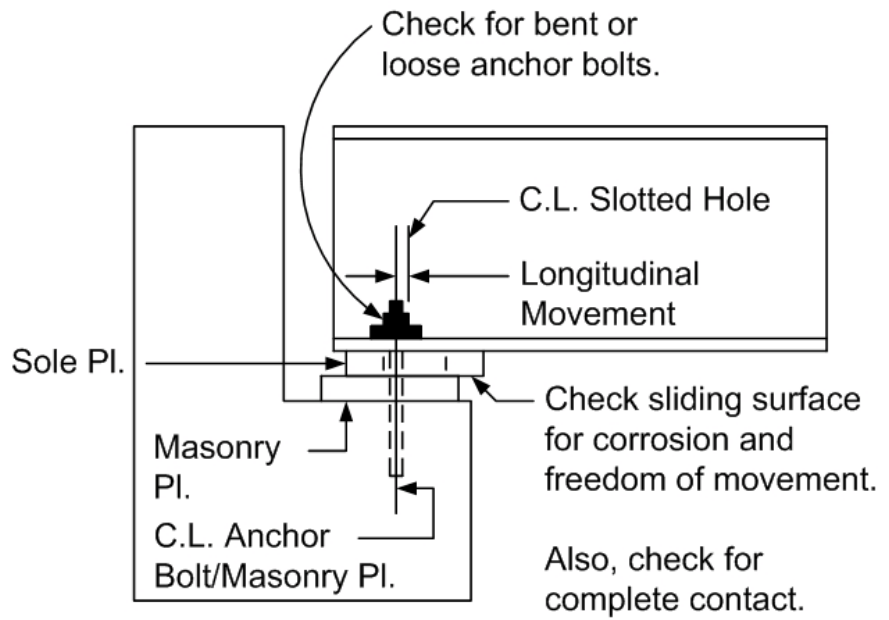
Sliding Plate Bearing Inspection Checklist Items
